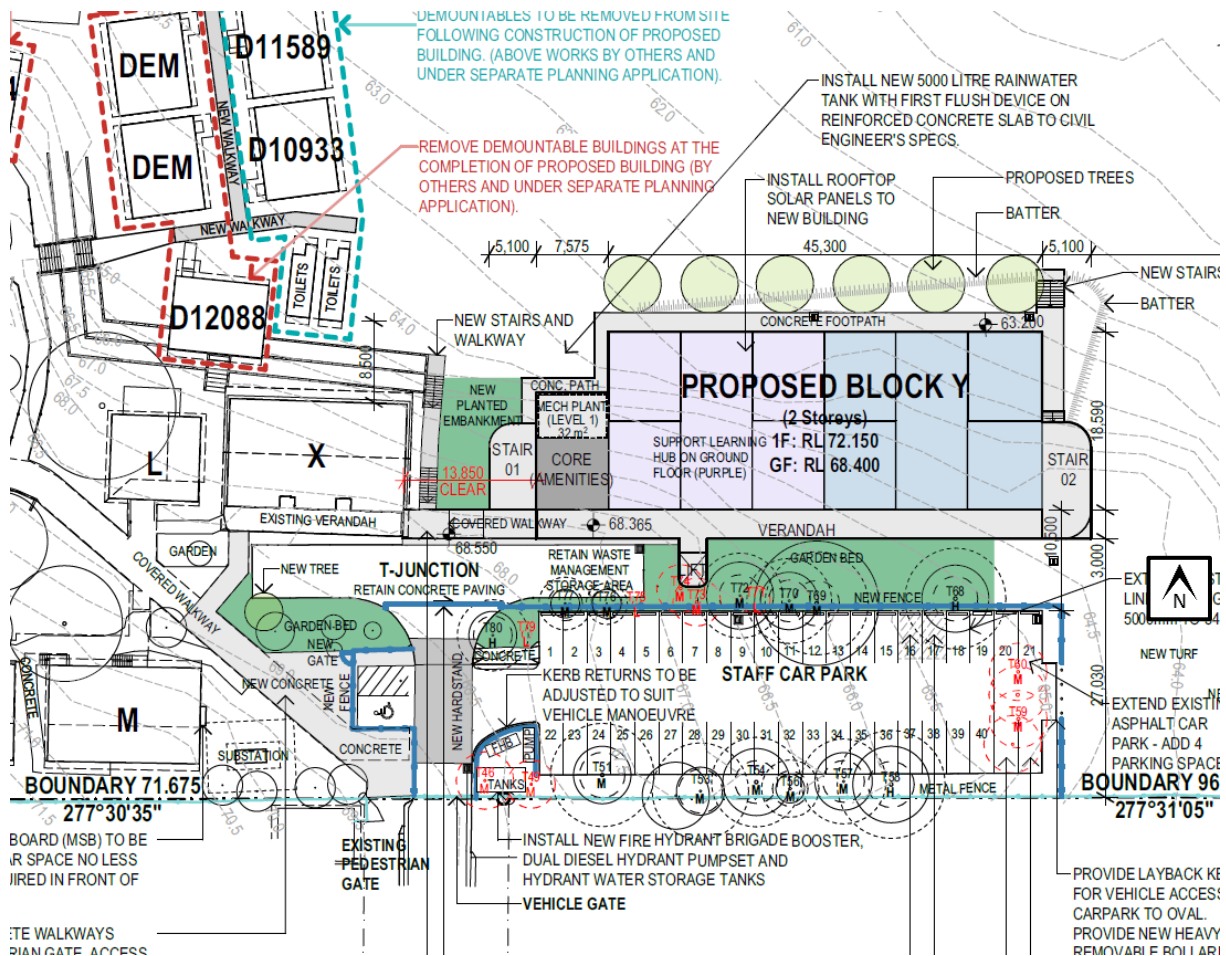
Proposed Site Plan prepared by Fulton Trotter Architects.
